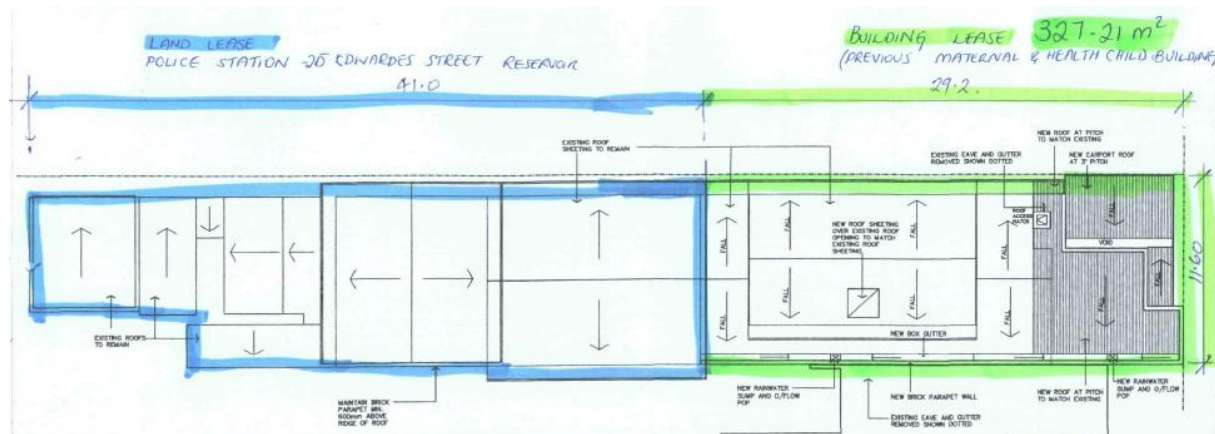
Floorplan of 25 Edwardes Street with the proposed section of the building to be demolished outlined in blue.
